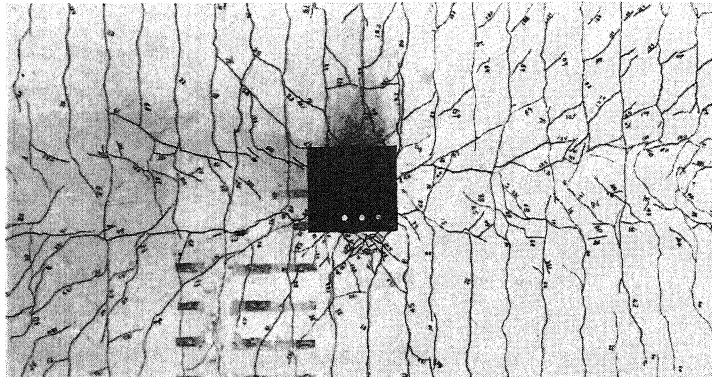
SPECIMEN NO. 1 - CRACK PATTERN AFTER 20 CYCLES
